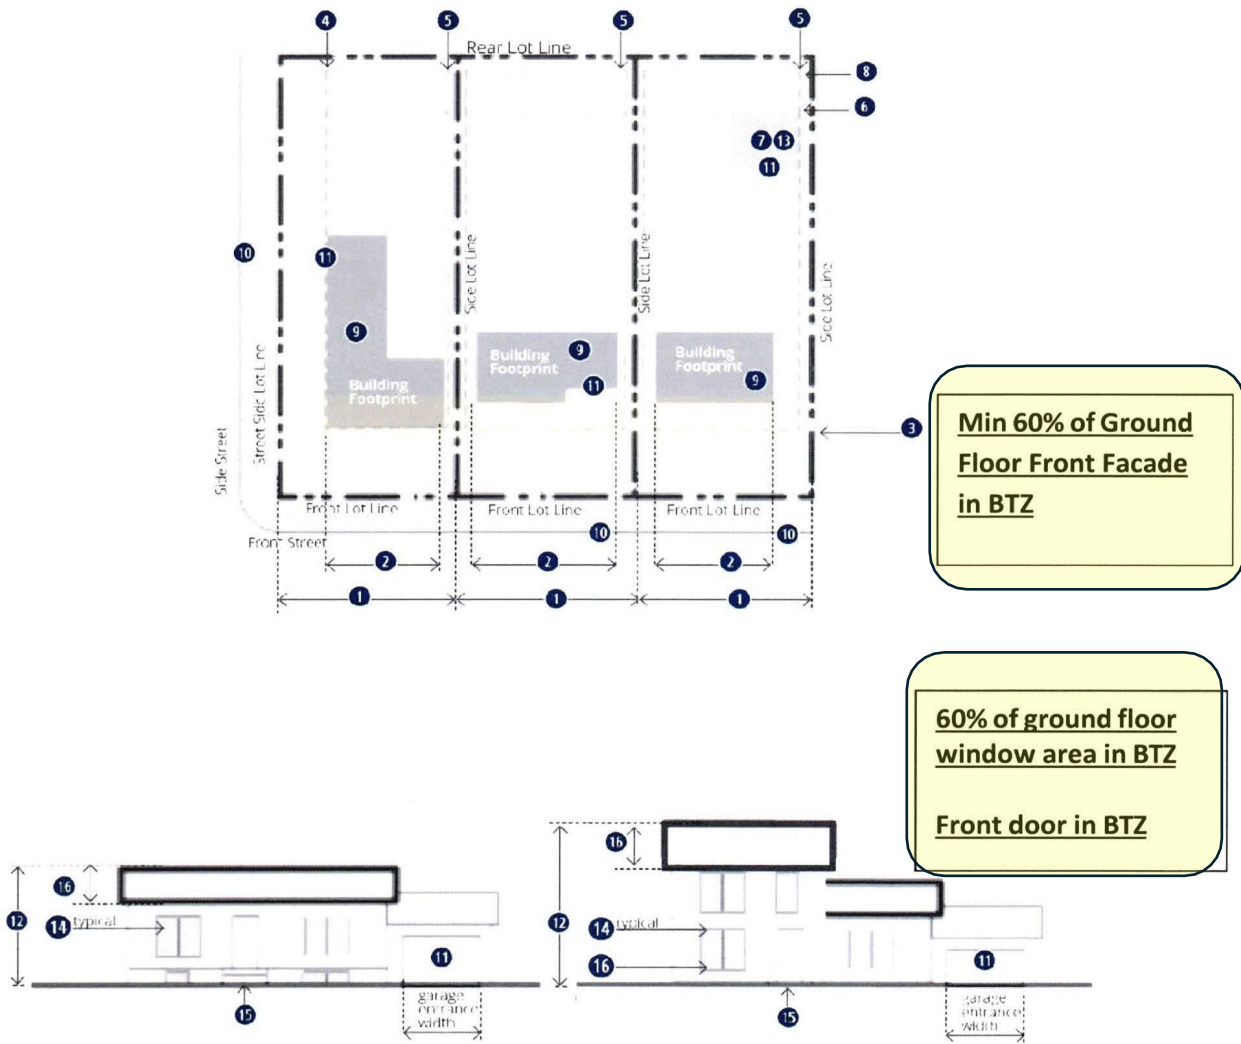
(6). N2 district diagrammatic plans and elevations.
